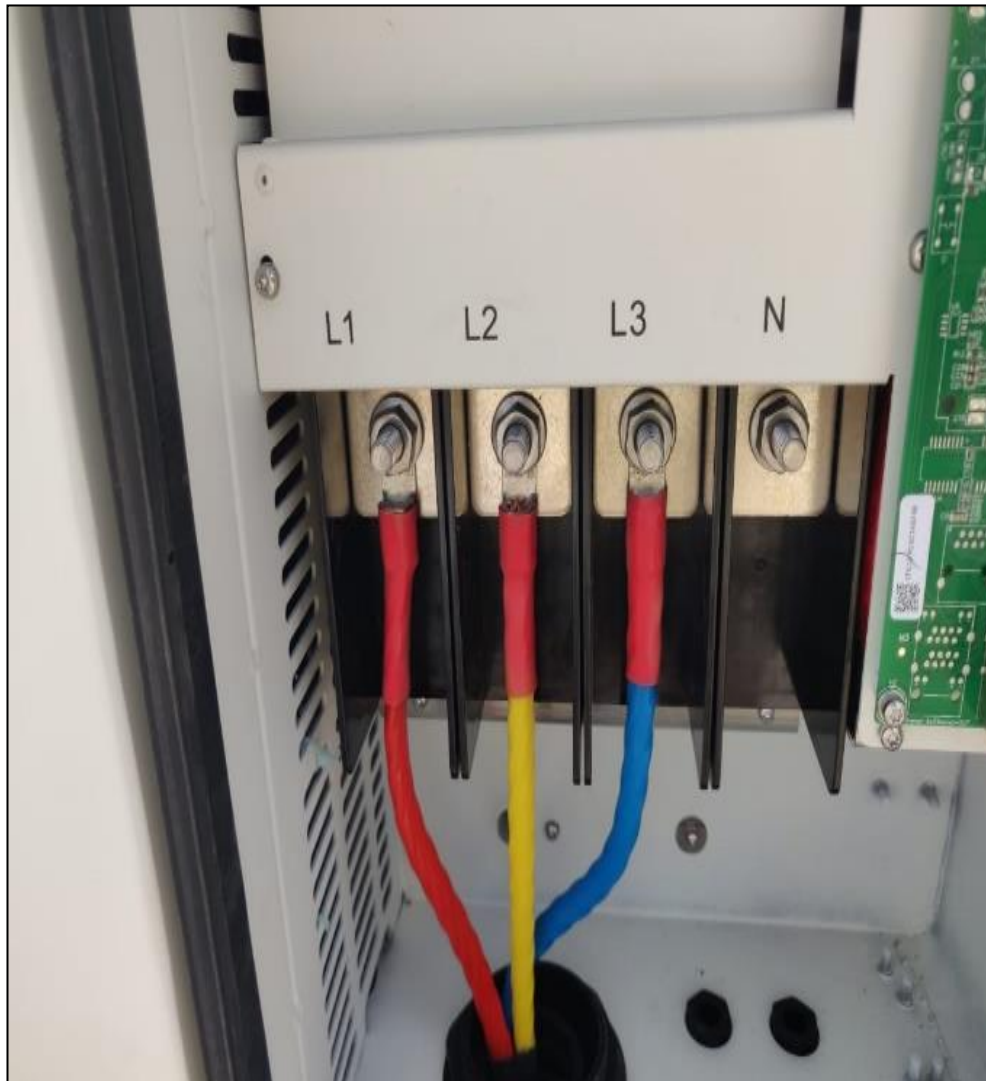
Front View of AC Cable Termination -Solis 80K-5G
